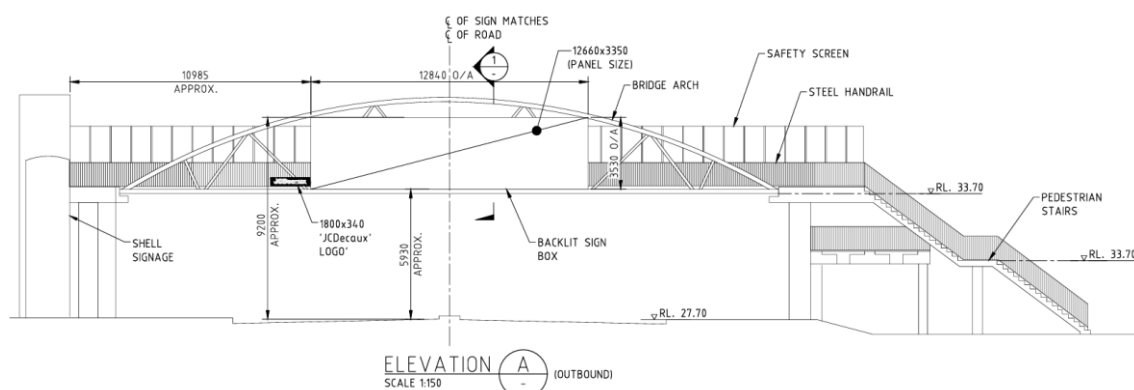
Sign elevation - east (Source: Dennis Bunt Consulting Engineers)
